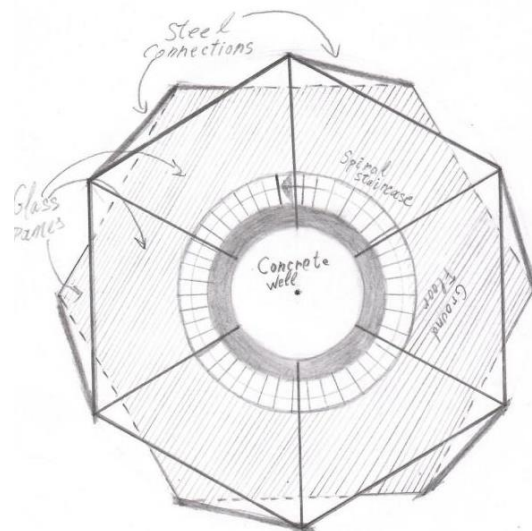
Section with a horizontal plane. Spiral staircase around the concrete core for access (one of the options).
